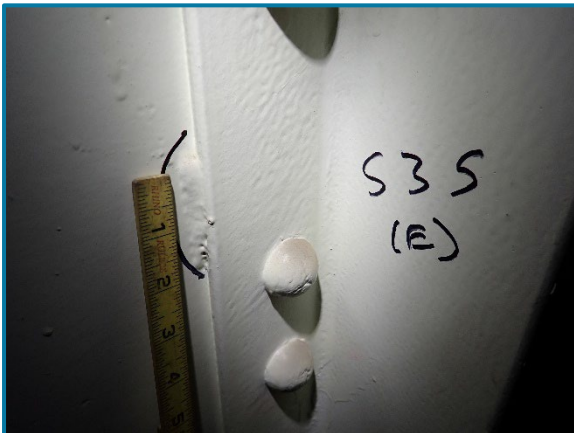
Typical tack weld on the south web plate and transverse stiffeners on the interior of Pier cap 5A (looking southwest).
